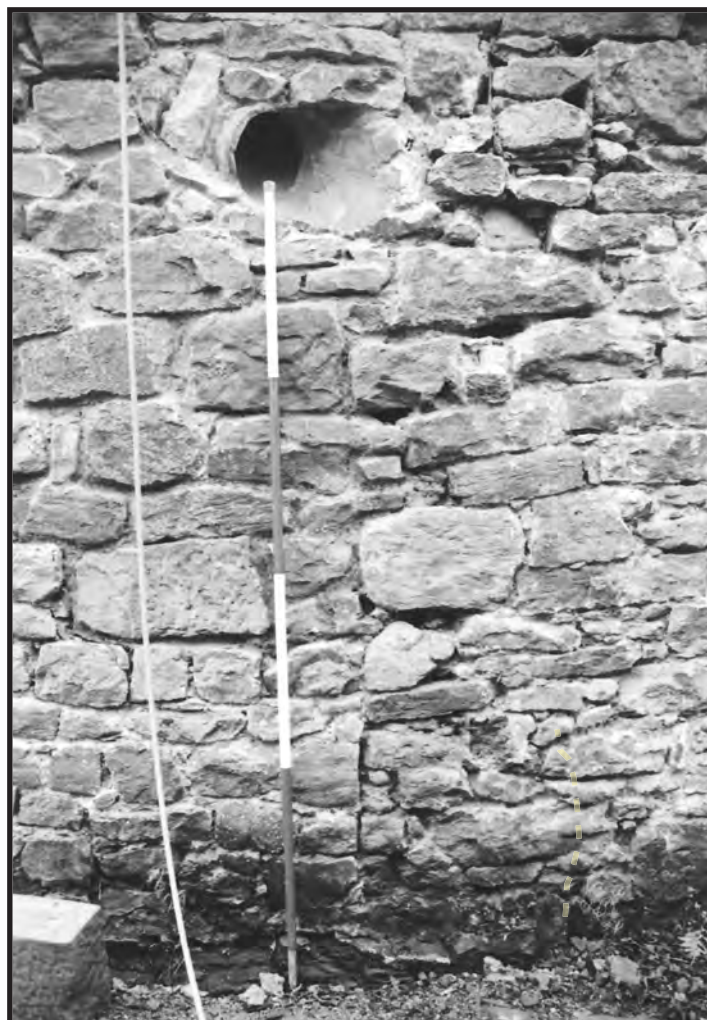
Detail of a blocked opening (F15) along the north-west facing elevation of the central wing of Building A to the south
